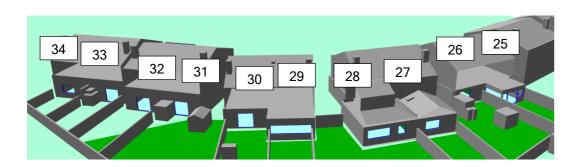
Indicative Window Locations assessed for adjacent dwellings at Park Crescent West of Proposed Development
